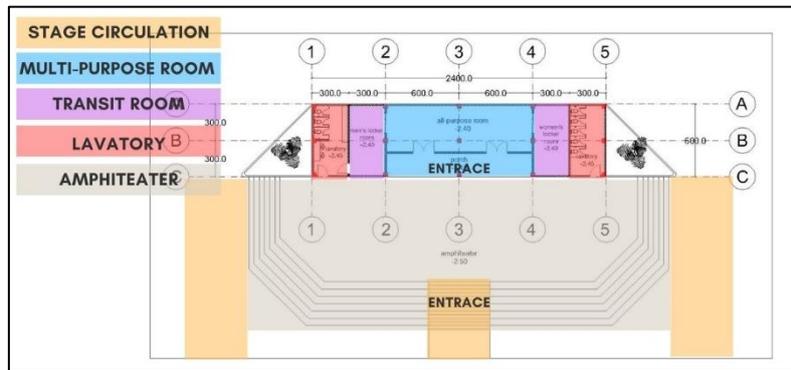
Amphitheater and Multipurpose Room Floor Plan
